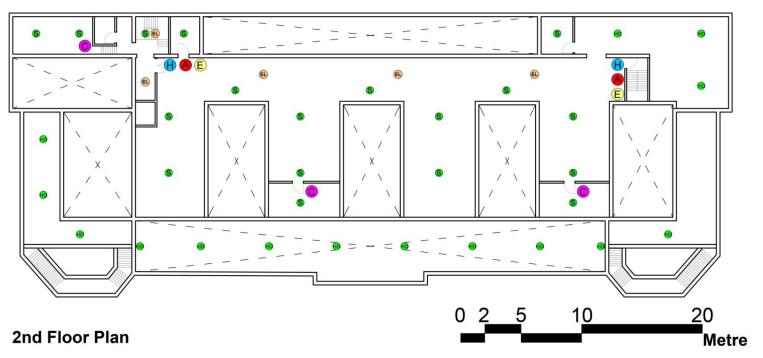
Location of active fire protection measures at Second Floor Level of Sultan Abdul Samad (Block B)
